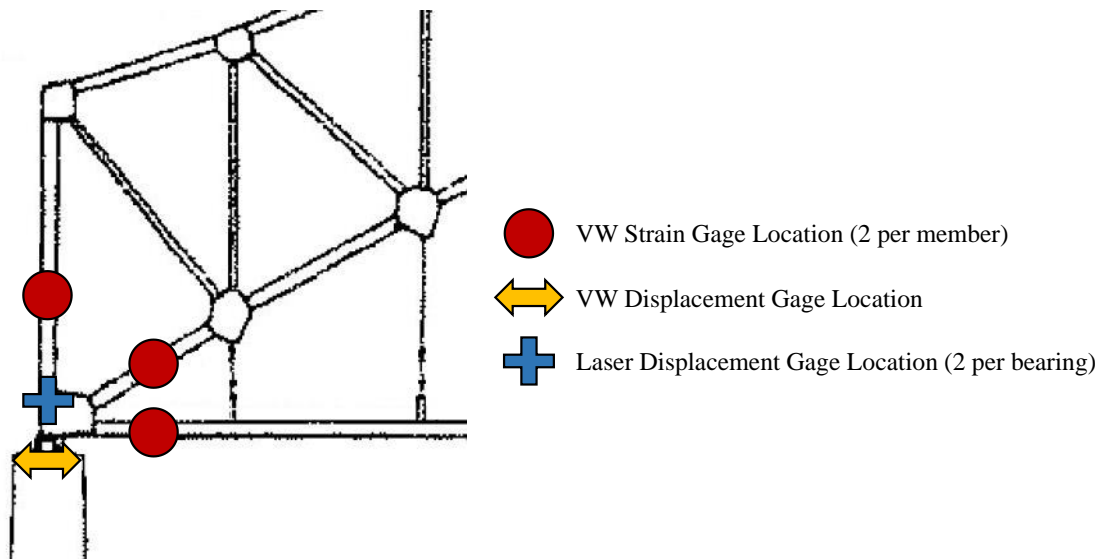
Pier A Instrumentation Setup (upstream and downstream sides)
